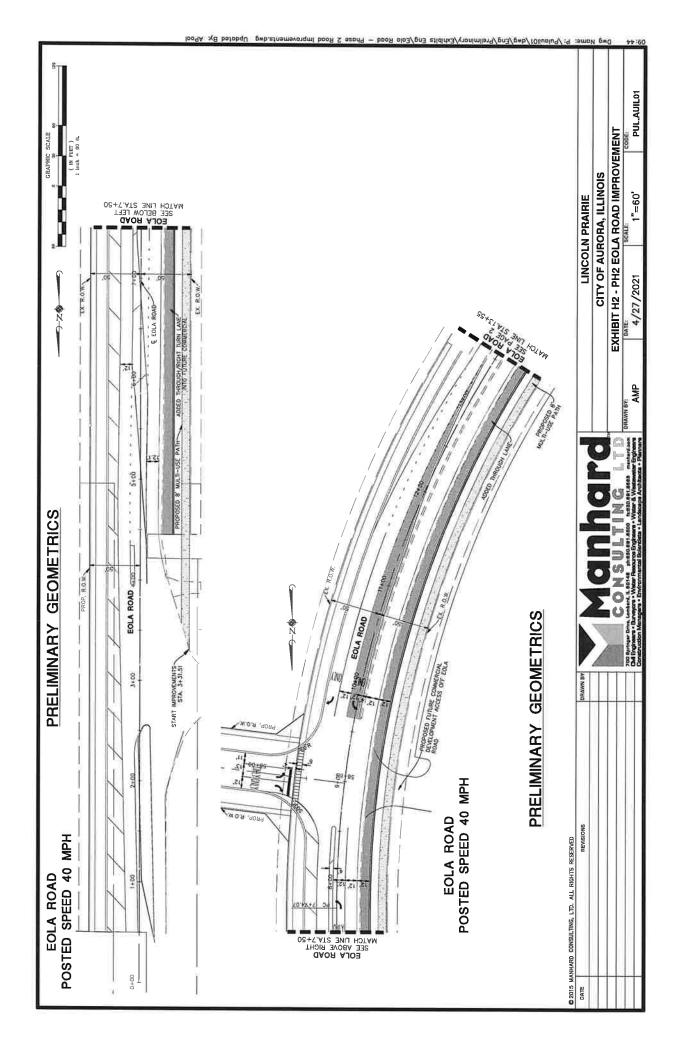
" PH2 EOLA ROAD IMPROVEMENT
